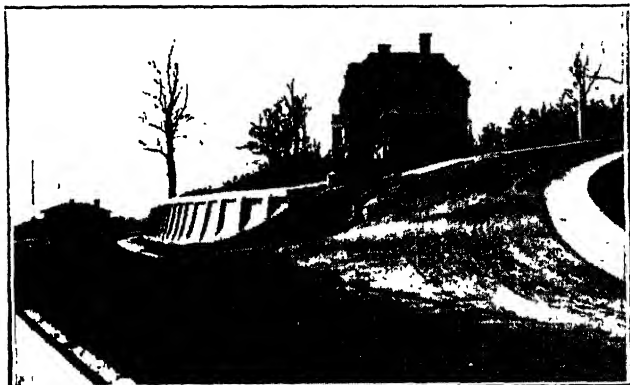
STREET WINDING UP HILL, WESTMOUNT, CANADA. RETAINING WALL. FOOTWAY BY STEPS AT END OF WALL (BARELY VISIBLE)
